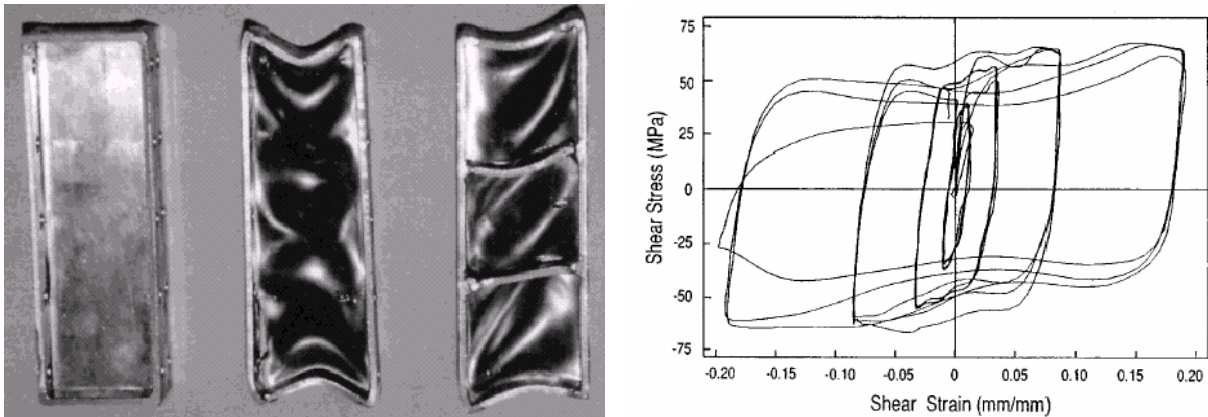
Aluminum shear links: tested specimen (left) and typical hysteretic loop (right) (after Rai and Wallace, 1998).
